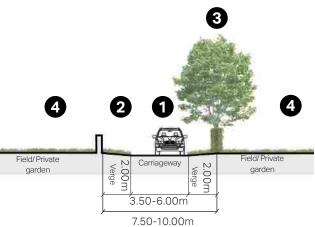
Section showing indicative dimensions for secondary rural route (carriageway width may vary)
